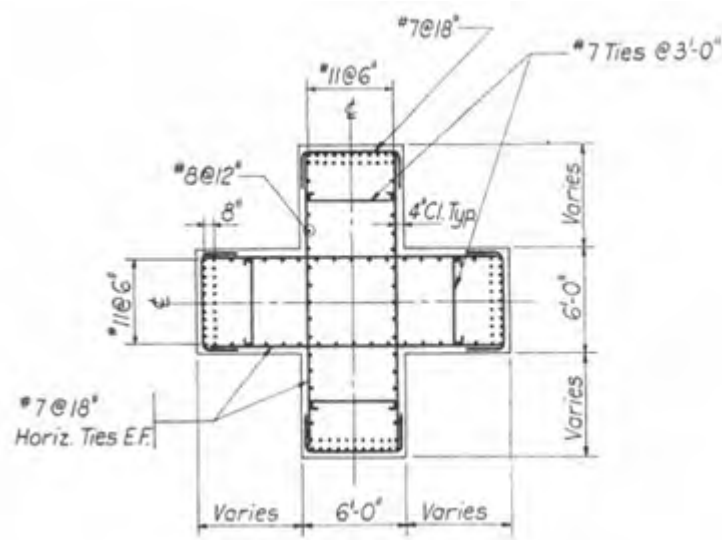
Cruciform shape of tower cross-section (courtesy of NAIC)
